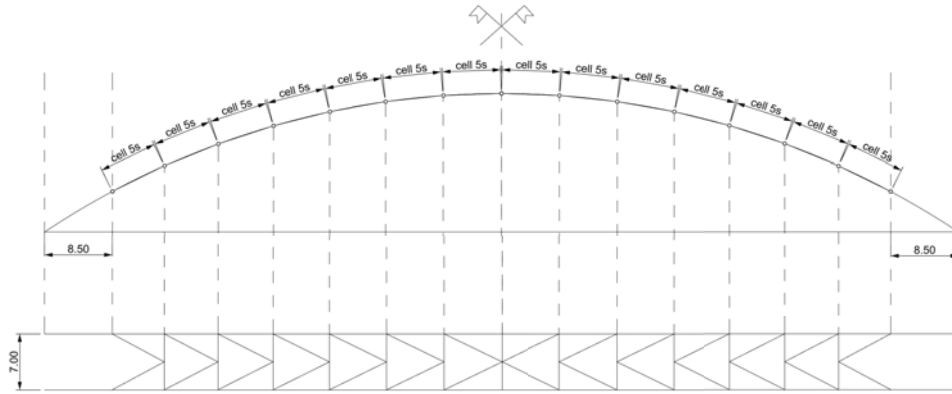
The bracing cell arrangement, where s means spacing between hangers arch anchorage
